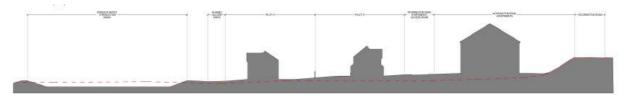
Proposed site section showing north (right) Accrington Road to south (left) River Calder
